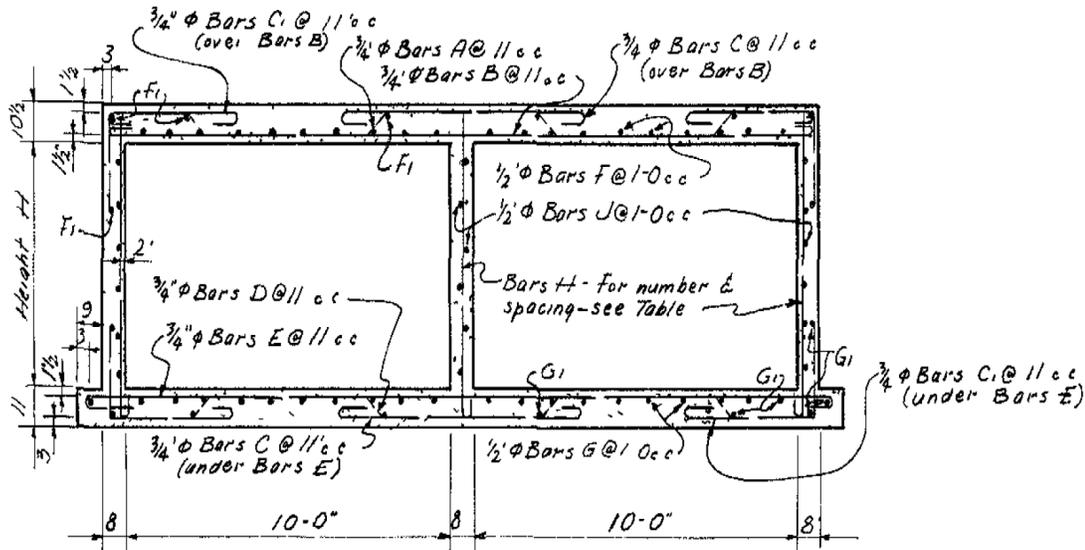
Culvert Built Before 2000 Typical Cross Section
